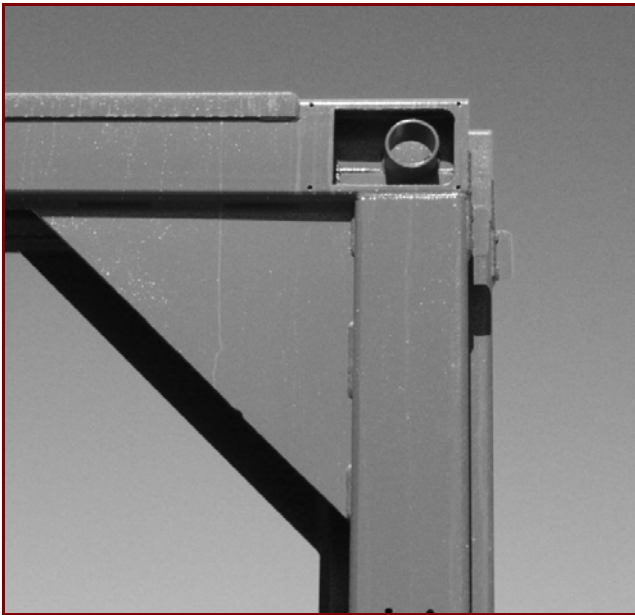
View Behind Gate Access Plate for Security Cable Removal and Replacement (Right Side Shown)
